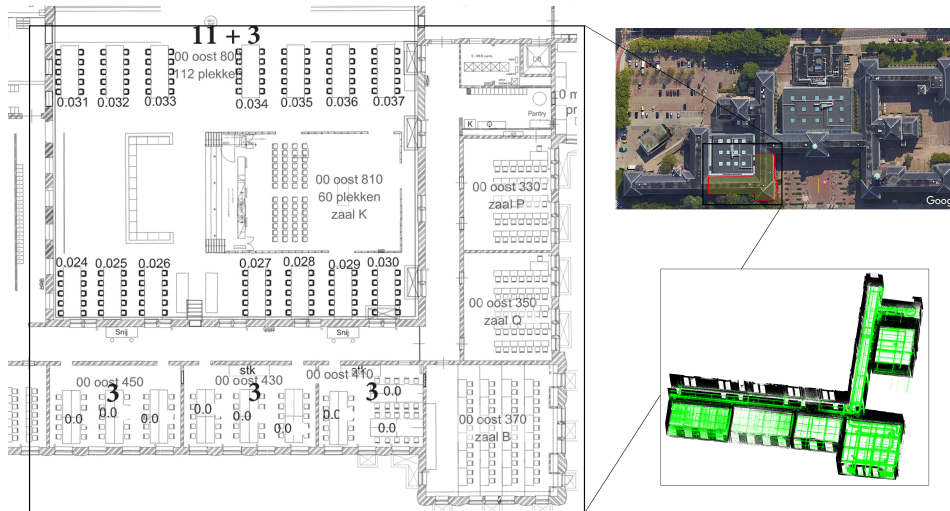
Fusion between Point Cloud model & Floor Plan
